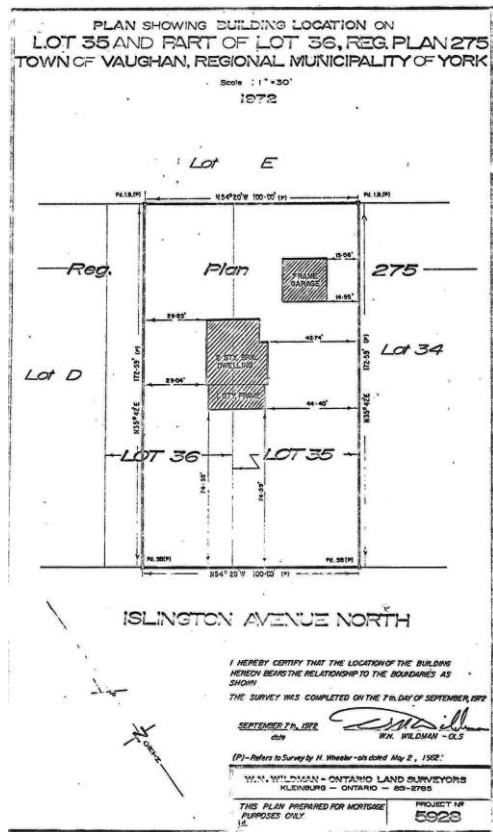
1972 Survey showing no addition to the south (right) side. From Vaughan Archives.
